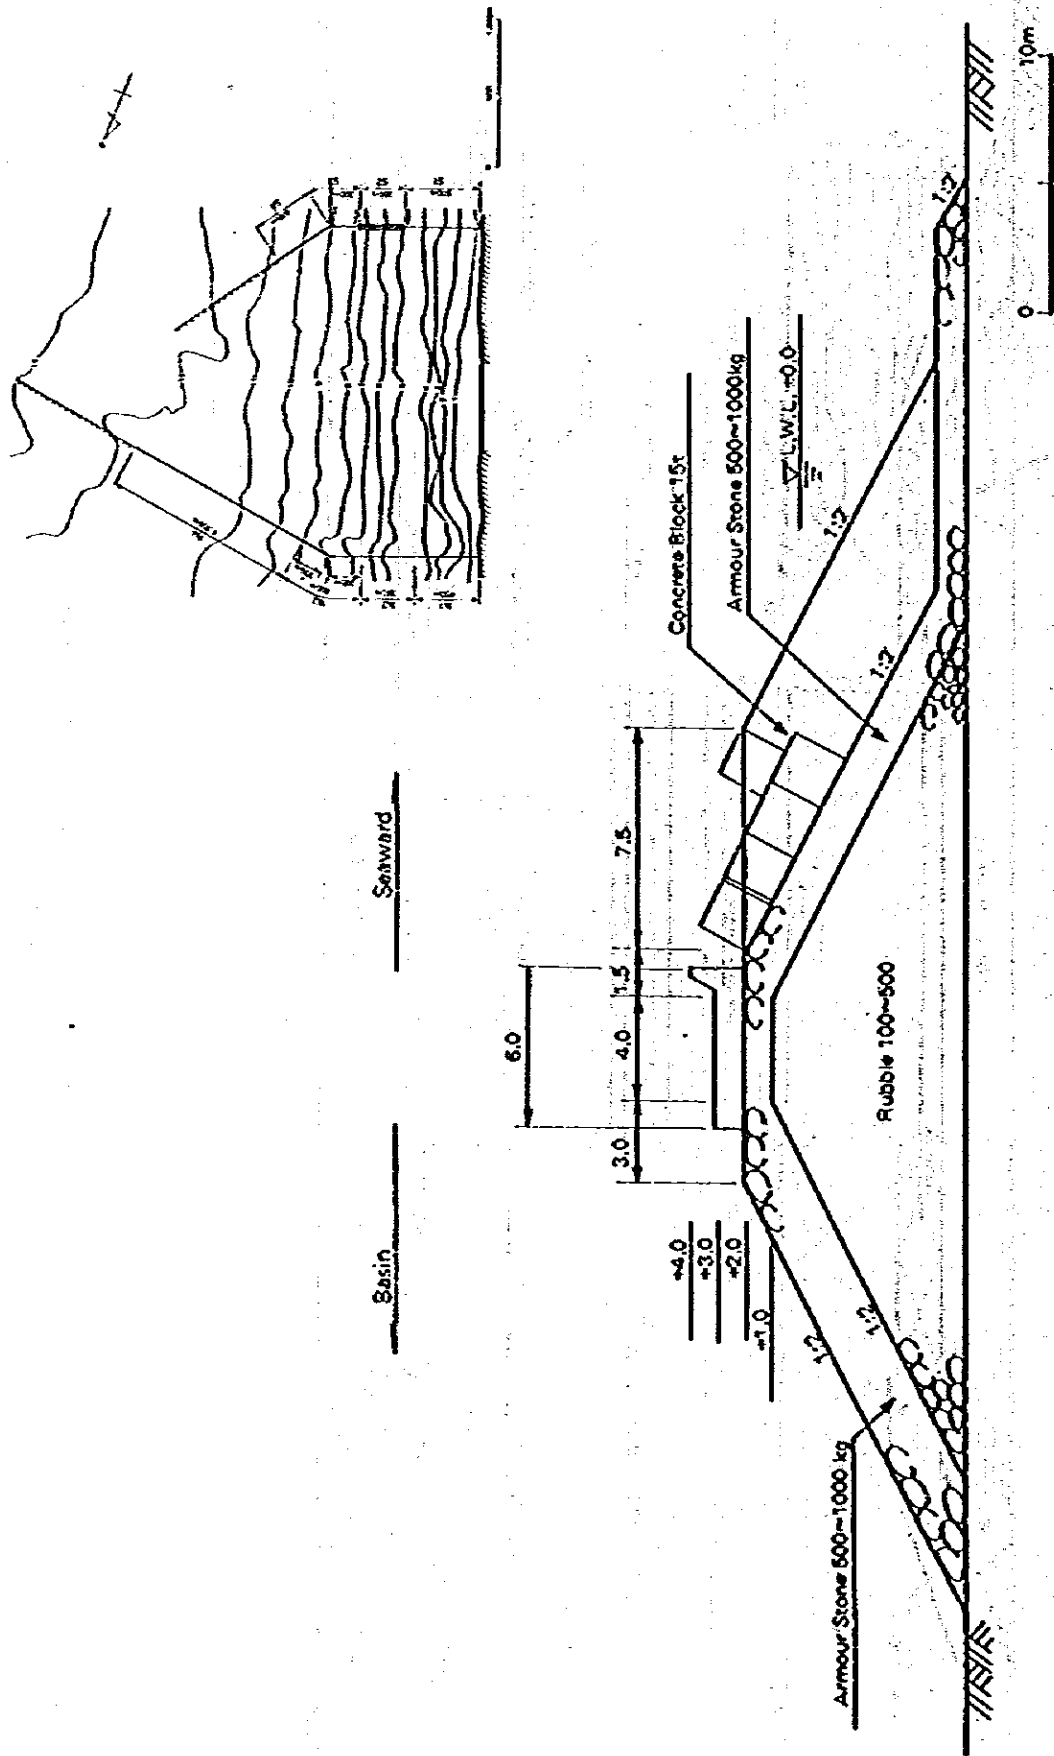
(7) Standard Crosssection of Breakwater (S2 Section)
